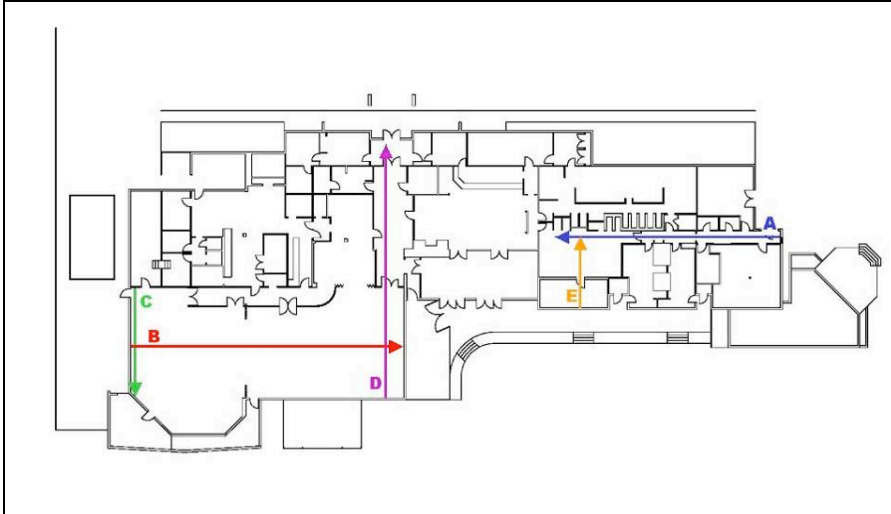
Floor plan of the Event Center Building showing the locations of floor levelness measurements for both 2008 and 2013.
